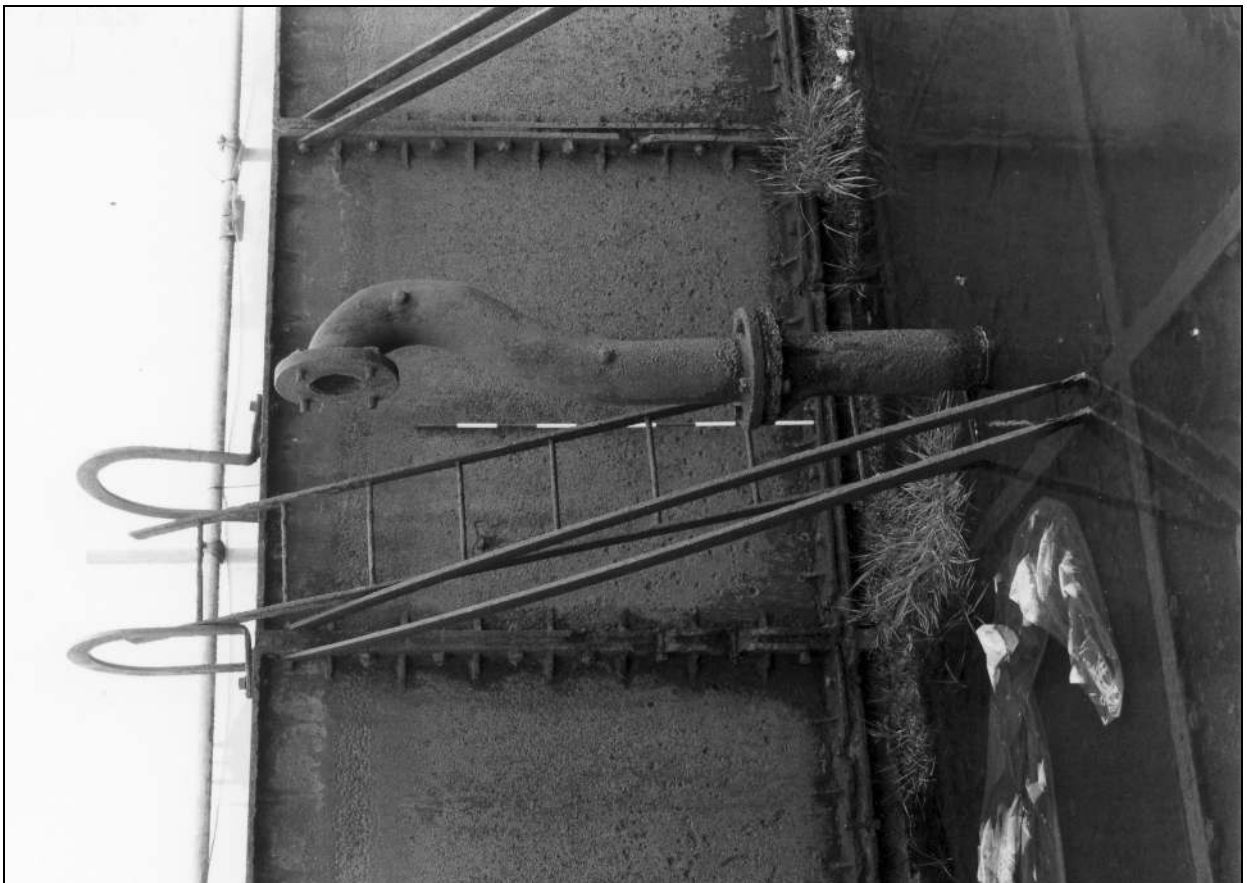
Detail of original feed pipe, with adjacent ladders (film 7, frame 6)
